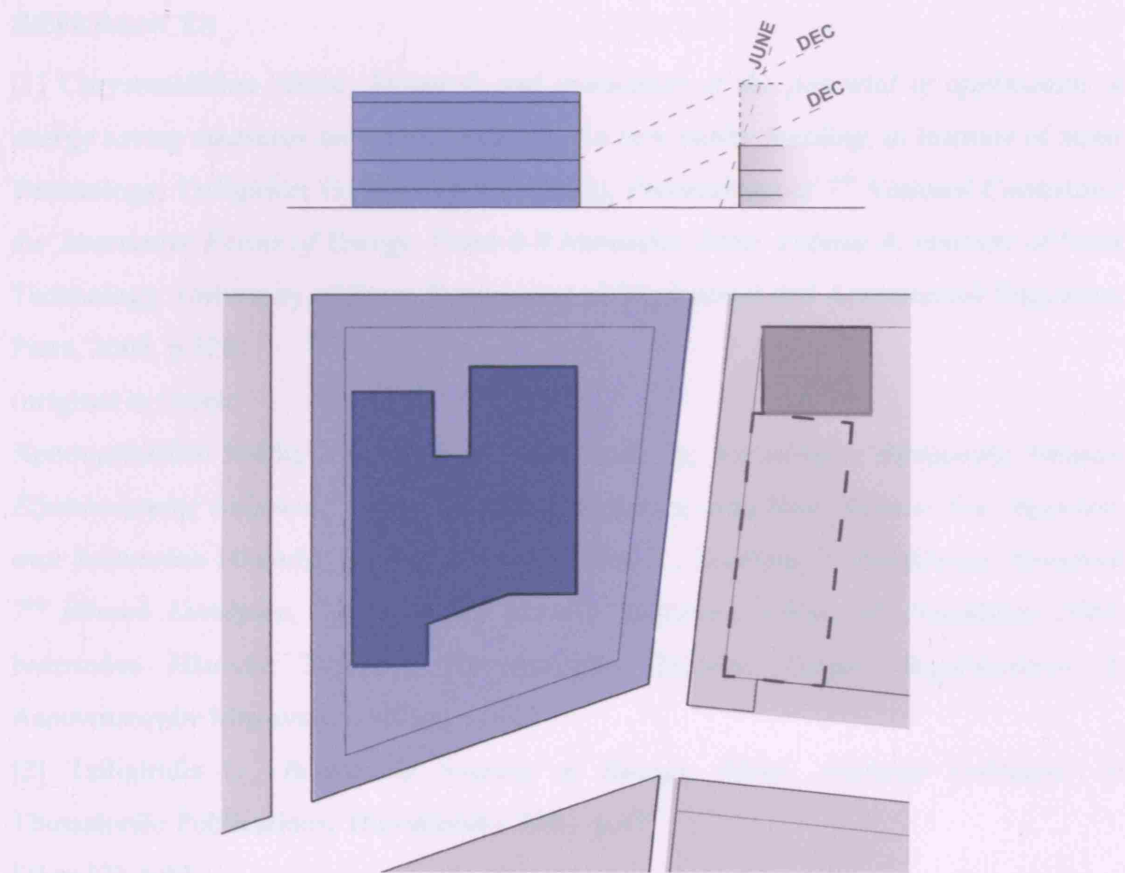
Site plan and Section indicating effect of future worst-case scenario concerning adjacent building
